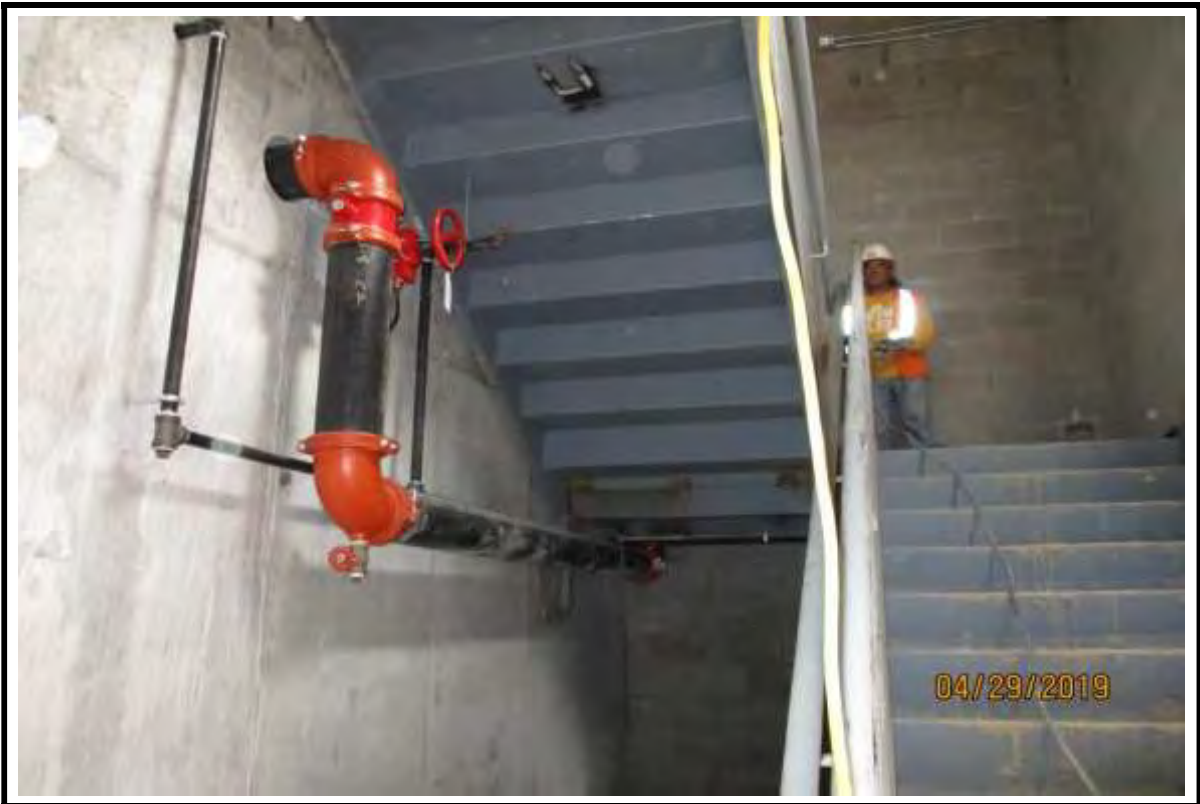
CMU stair tower with wood framing on podium at Building “A”.
